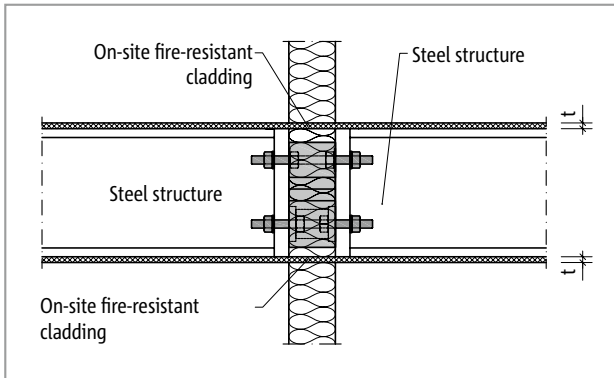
Fire protection Schöck Isokorb® T type S: On-site fire protection cladding for flush frontplates; section
